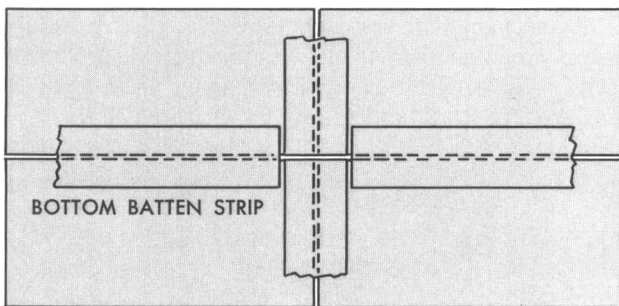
Joint Details—Prefabricated Asphalt Panel Linings
